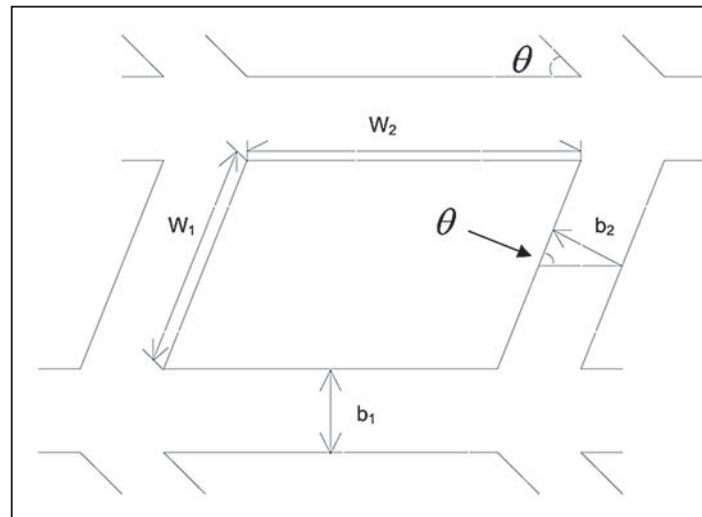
Definition of Pillar Design Variables Associated with a Parallelogram Shaped Pillar (Galvin et al 1998)
